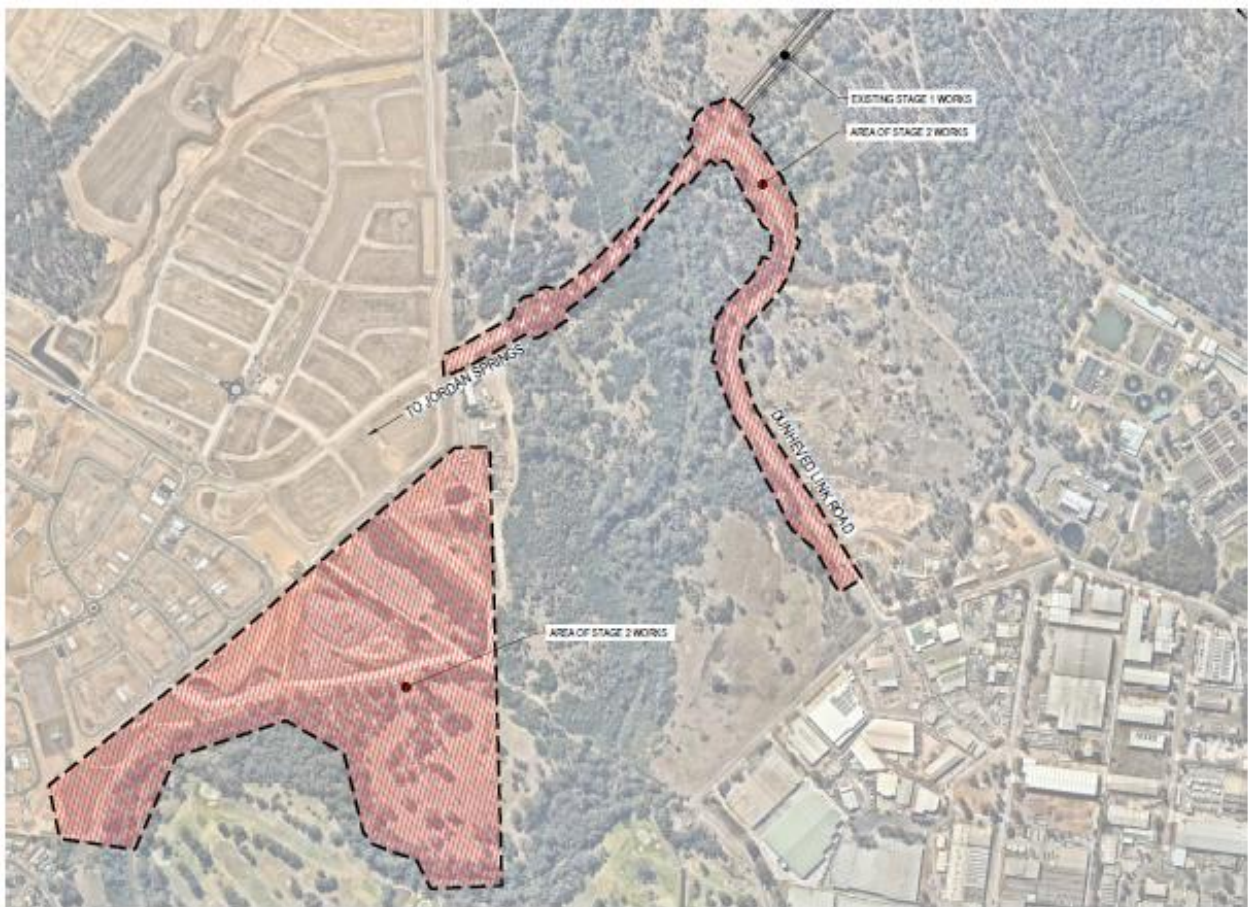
Audit location - East West Connector Road and Dunheved Link Road Stage 2
